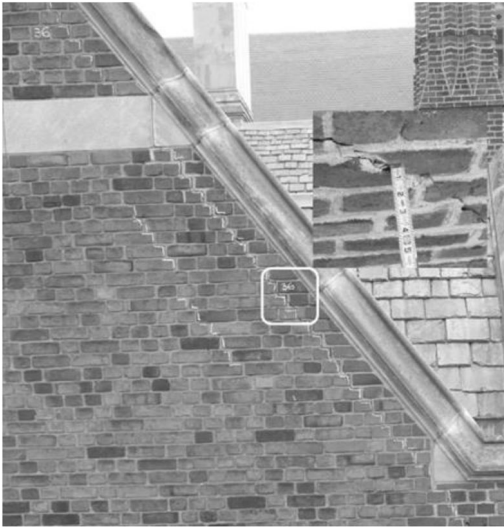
Gable end where parallels cracking coincides with the embedded steel beam flanges.
